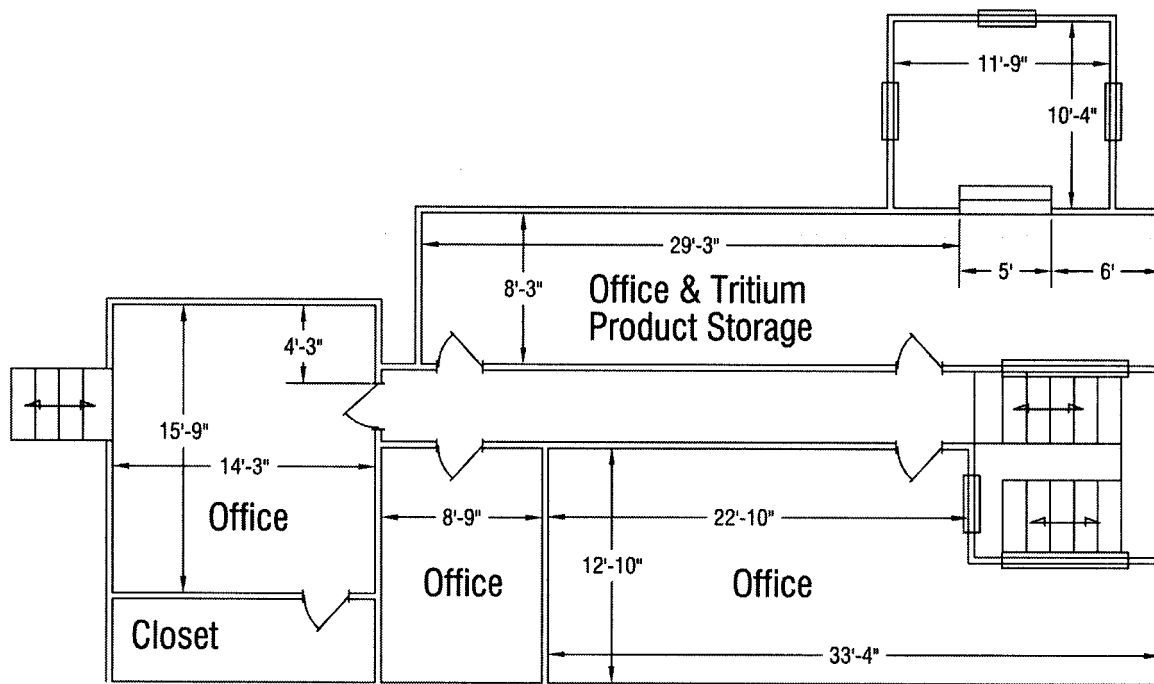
Third Floor of Isolite Facility, Berwyn, PA
